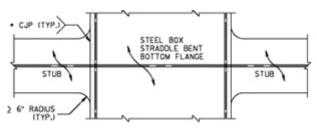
Longitudinal girder flange to bent cap stub
